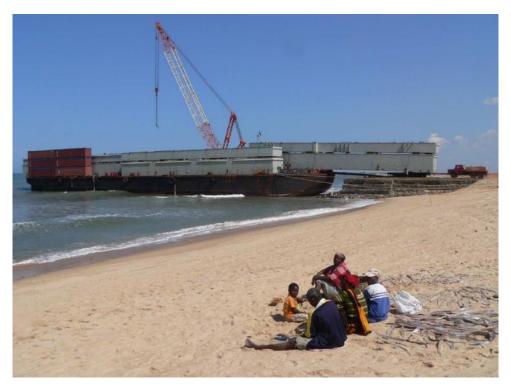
Typical beach landing site with barge off-loading heavy equipment (source: Comarco)
